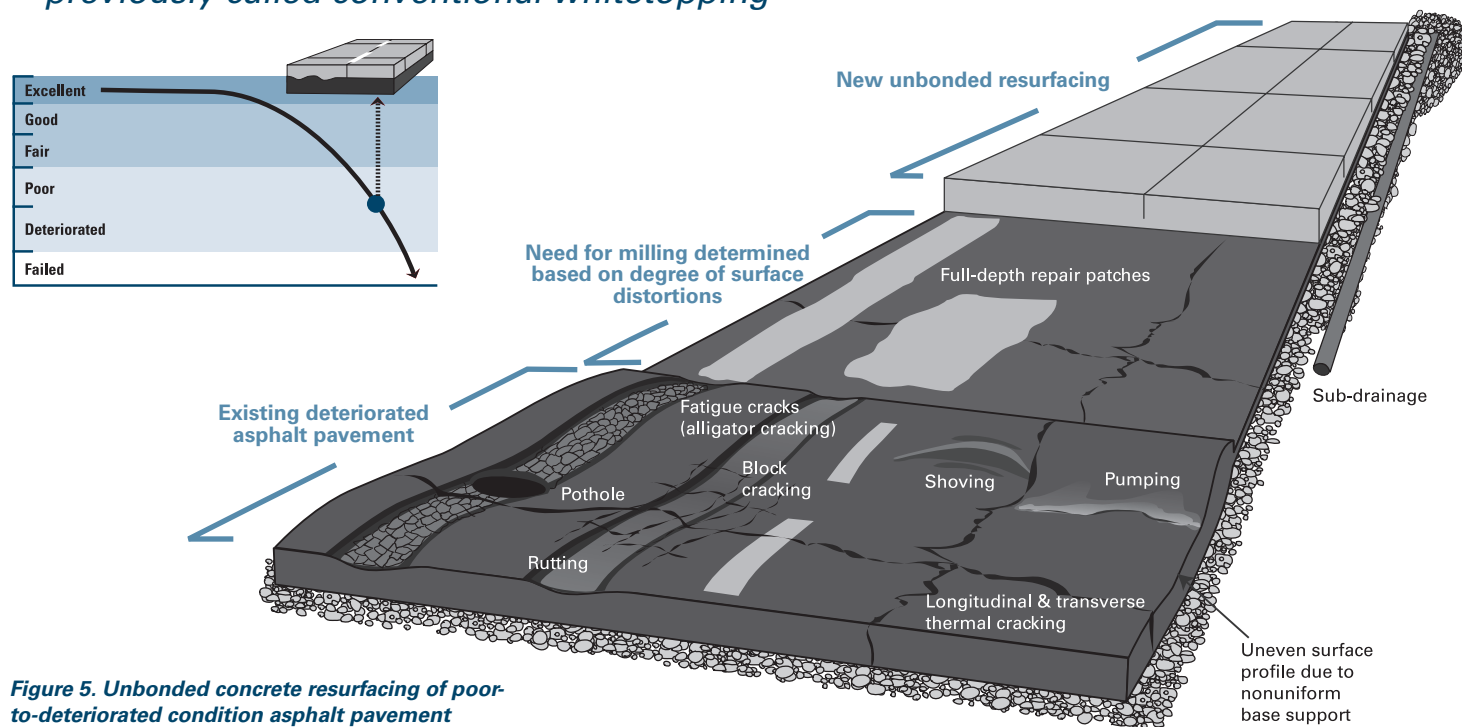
Unbonded concrete resurfacing of poor-to-deteriorated condition asphalt pavement
